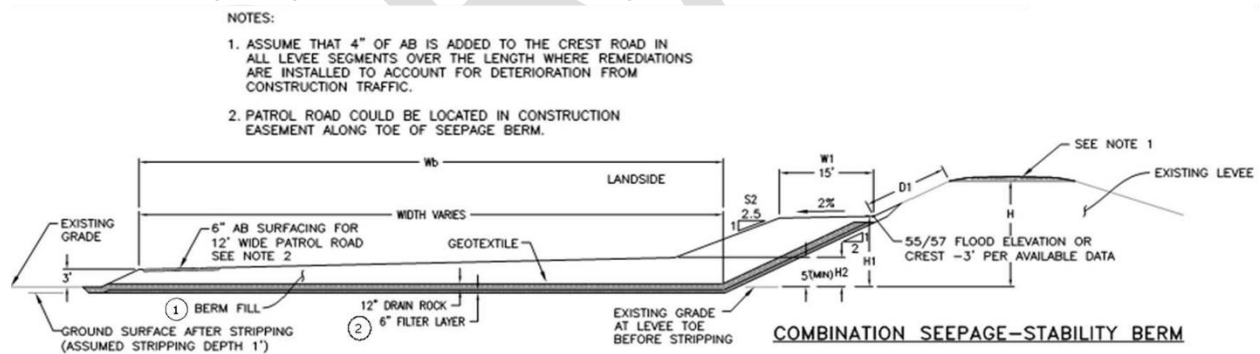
Typical Combined Drained Stability and Seepage Berm (adapted from URS, 2014b)
